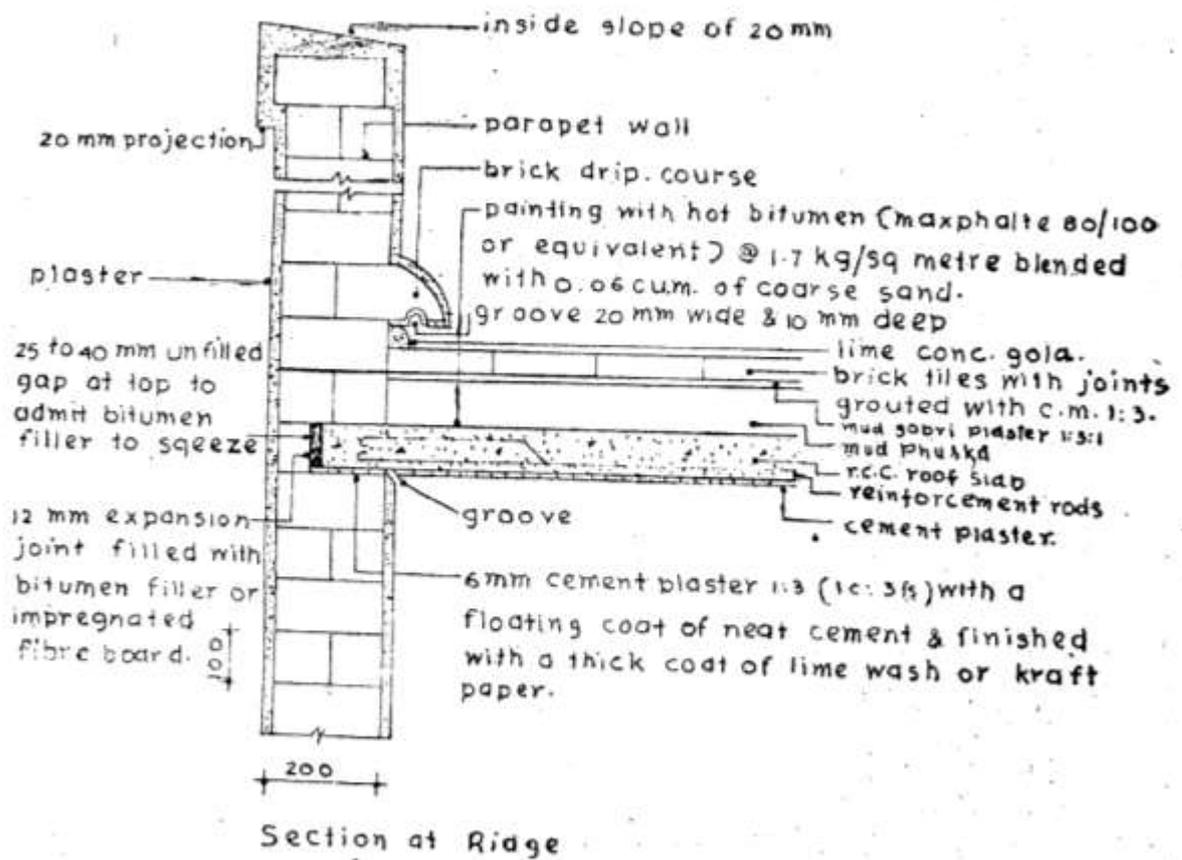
Brick Drip Course and Joint of Roof with Wall
